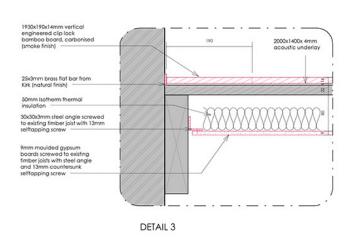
Detail of storefront connection to existing ground floor slab- not to scale (Author 2013)
